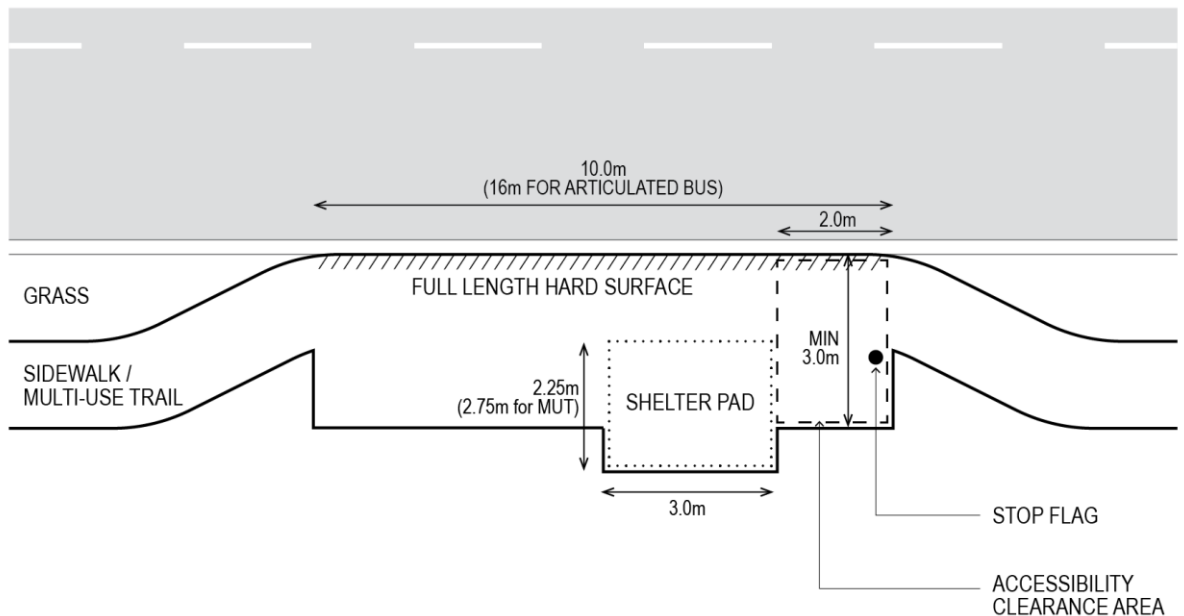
Typical Concept of Bus Stop with Additional Infrastructure – Boulevard width < 3.5 metres
